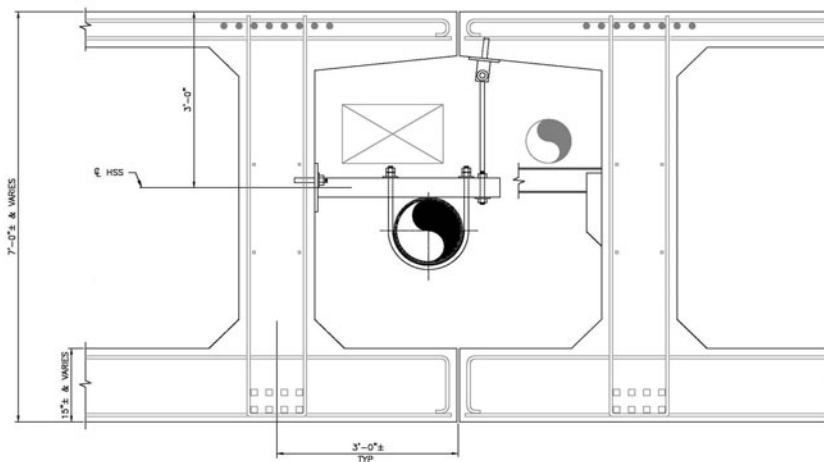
Detail for L.A. River Bridge Pipe Hanger
